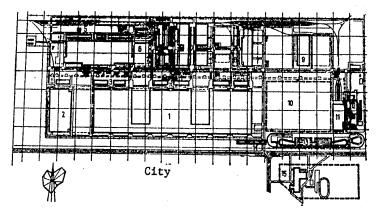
Master plan of a large enterprise. 1--Main building; 2--auxiliary shop module; 3--auxiliary production facilities of the main building; 4--power engineering and engineering support zone; 5--railroad stations; 6--press building; 7--group of casting shops; 8--group of forging shops; 9--spare parts production building; 10--finished product area; 11--dispatch area; 12--engineering center; 13--rolling track; 14--plant administration; 15--training center.
